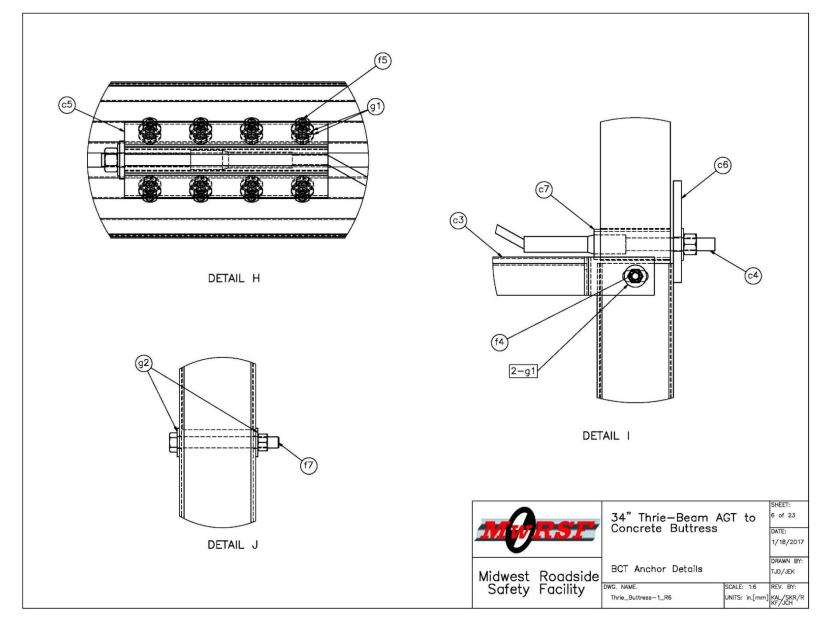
BCT Anchor Details, Test Nos. 34AGT-1 and 34AGT-2
